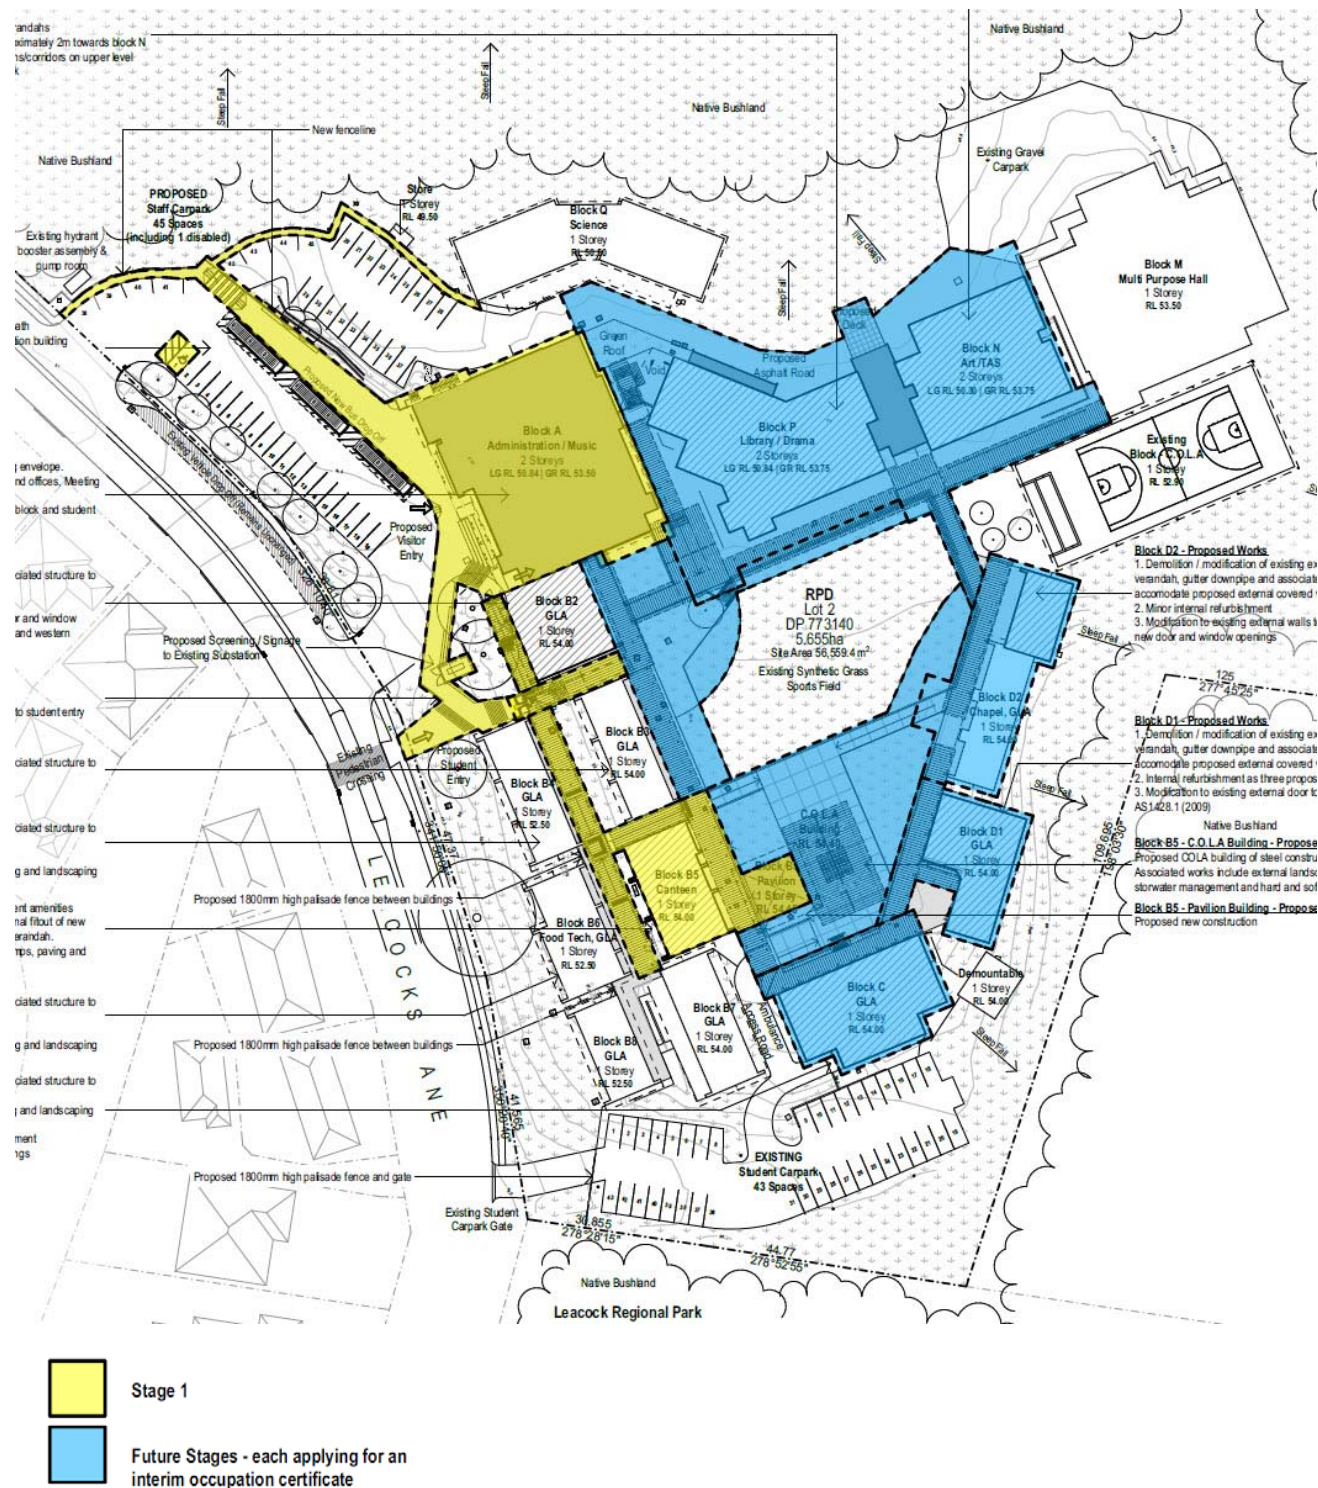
Proposed staging plan (Drawing ACD_1203) (Source: Fulton Trotter Architects)
